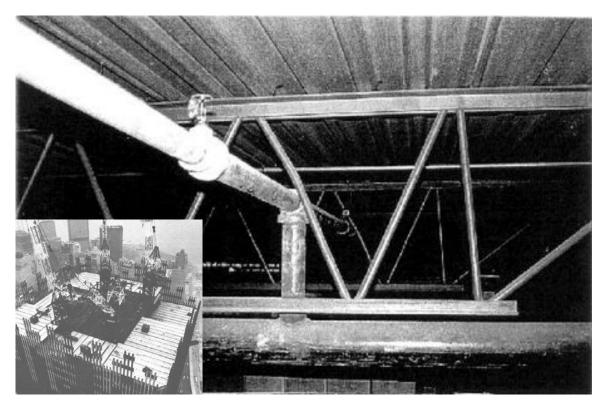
Open-Web Steel Joist: WTC, New York, 1960
